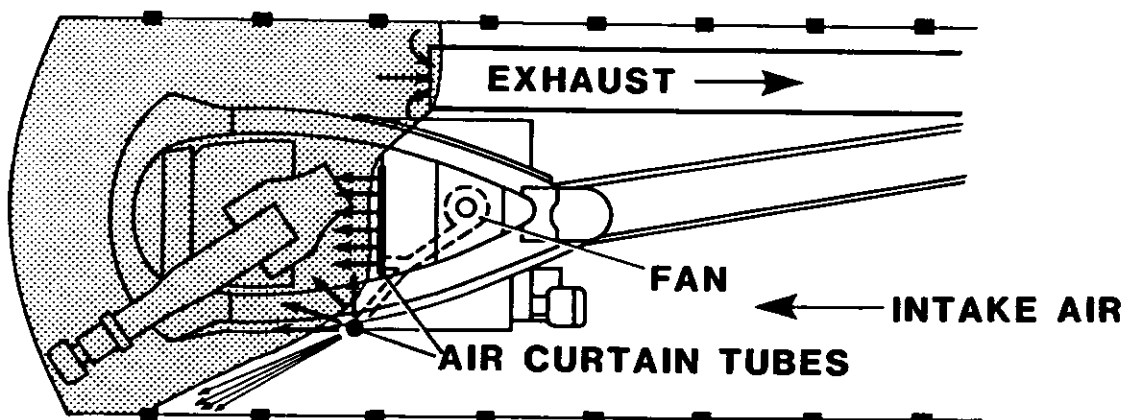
Plan view of drivage showing air curtains containing dust cloud.
